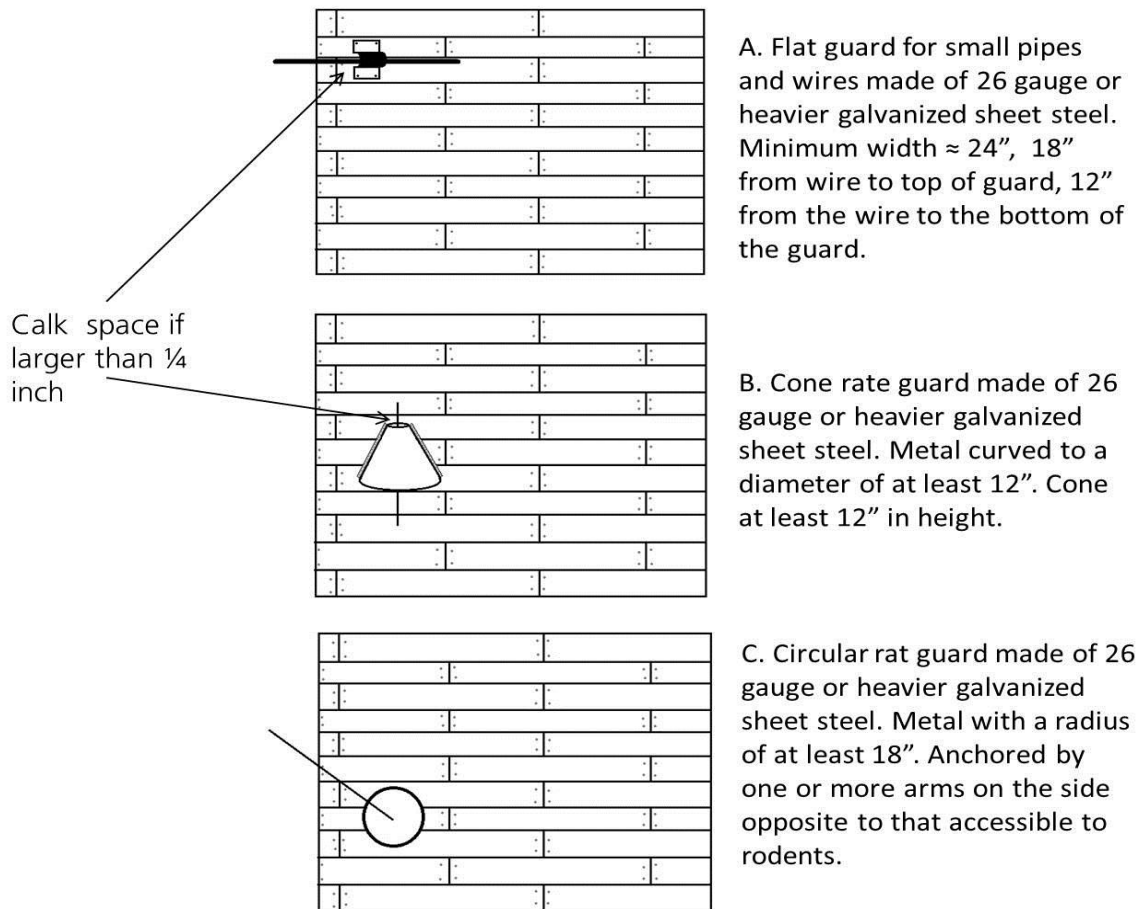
Examples of rodent guards constructed out of sheet metal. The heavy black line depicts wires entering or running along a building. The top graphic shows a flat guard for small pipes and wires. The guard is made of 26 gauge or heavier galvanized sheet steel. Minimum dimensions: 24 inches wide, 18 inches from wire to top of guard, and 12 inches from wire to bottom of guard. The center graphic is a rat guard made of 26 gauge or heavier galvanized sheet steel. Metal curved to a diameter of at least 12 inches. Cone is at least 12 inches in height. C. Circular rat guard made of 26 gauge or heavier galvanized sheet steel. The metal has a radius of at least 18 inches and is anchored by one or more arms on the side opposite to that accessible by rodents. Figure credit: Internet Center for Wildlife Damage Management, <http://icwdm.org/handbook/rodents/RodentExclusion.asp>.
